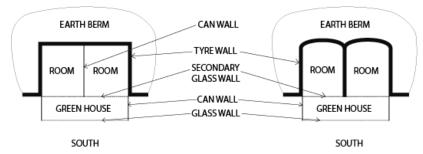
Schematic floor plan of "Packaged Earthship" (left) and "U module system" (right) [13]
